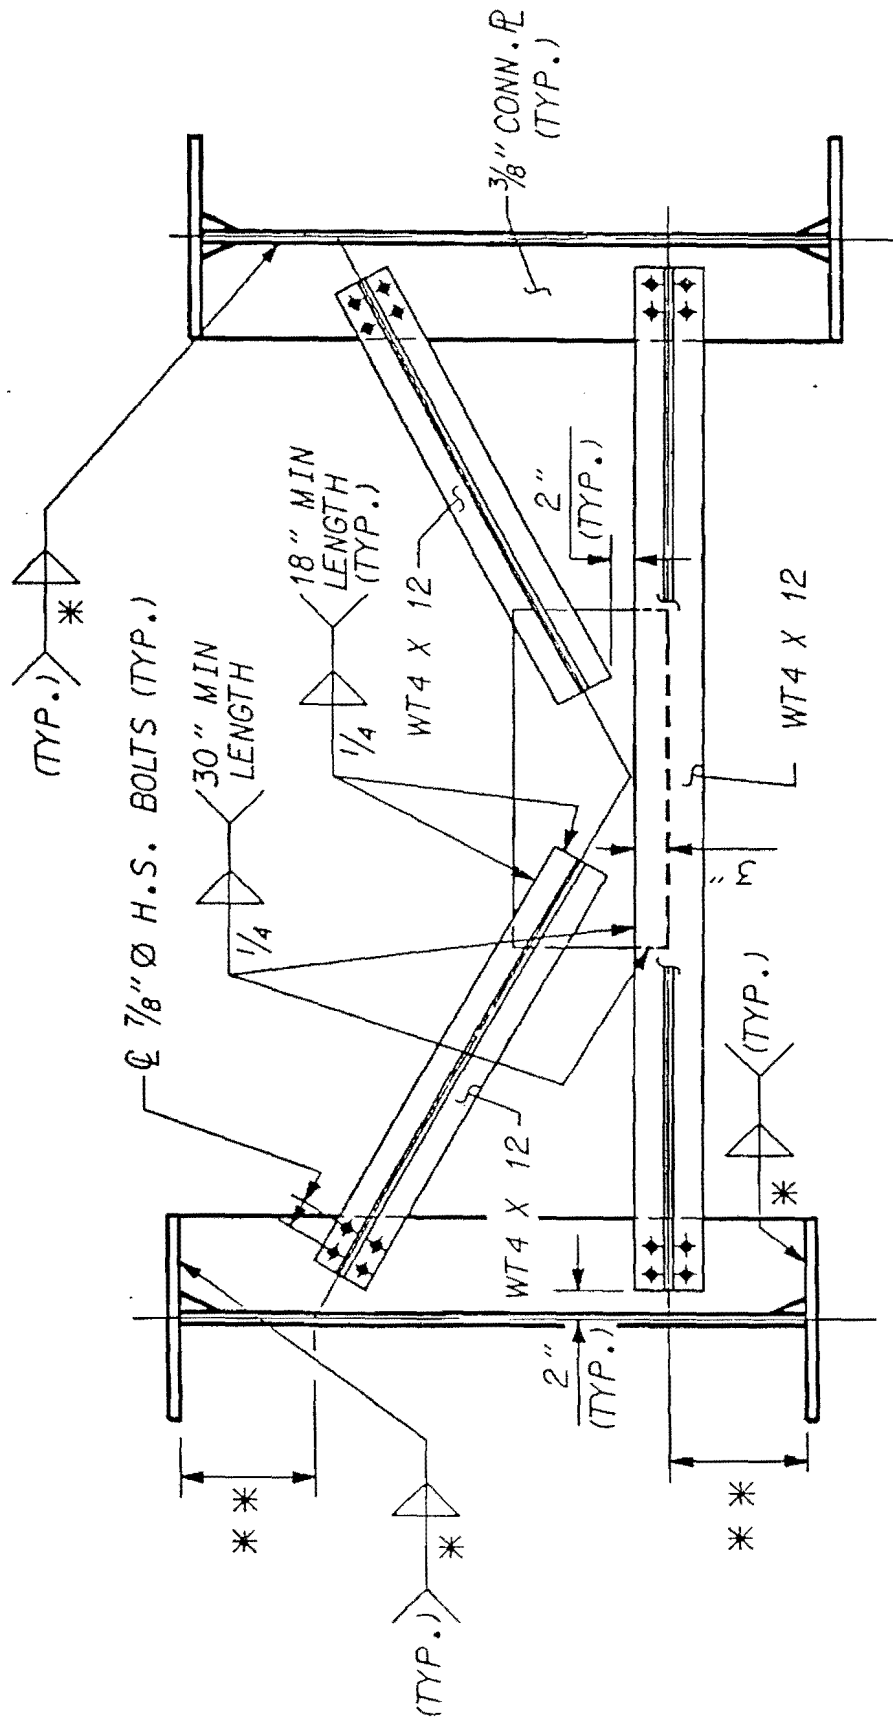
Standard intermediate pier cross frame diaphragm detail used by the North Carolina Department of Transportation.
